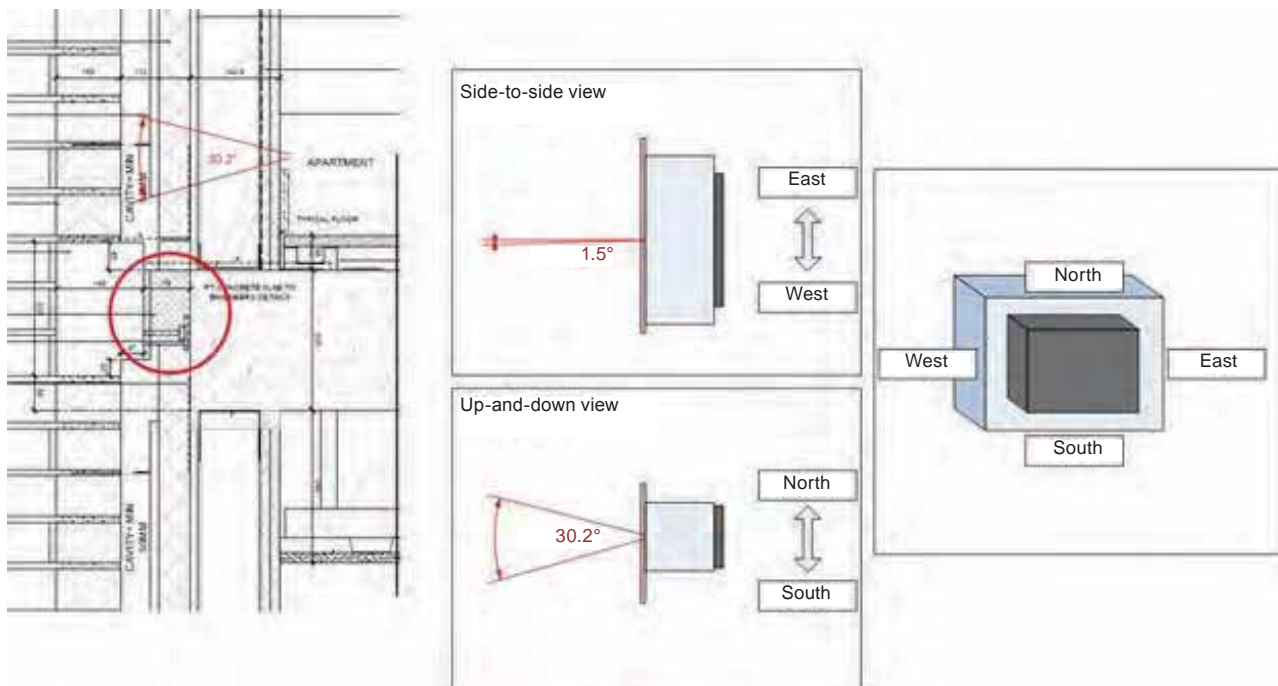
A typical light steel-frame construction showing the fire stopping (circled) and the typical field of view for ground-penetrating radar
